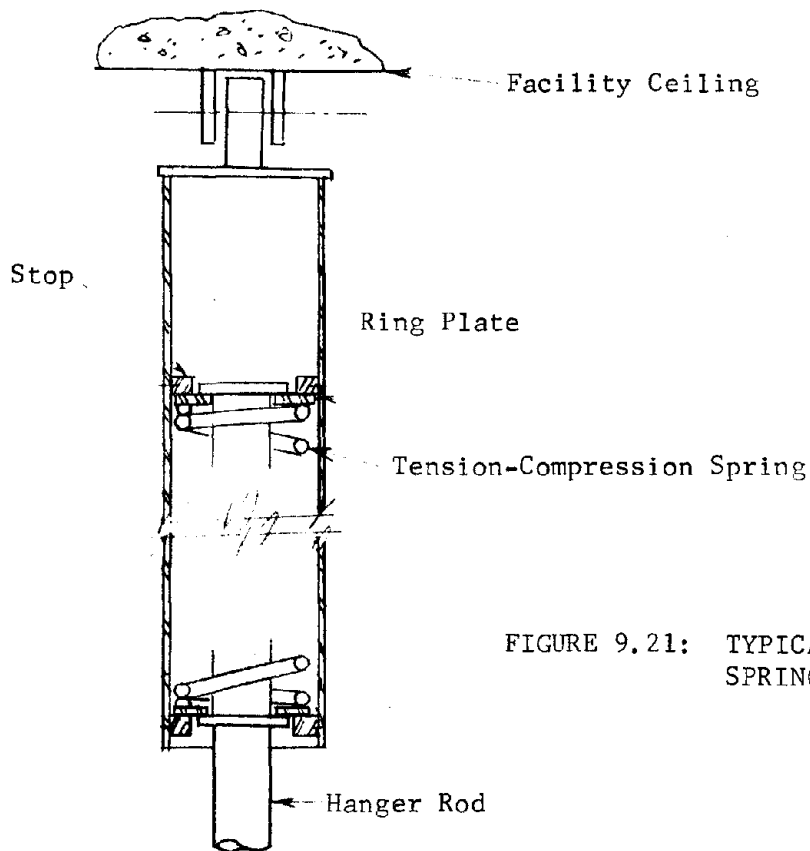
TYPICAL COMPRESSION SPRING CAN ASSEMBLY
